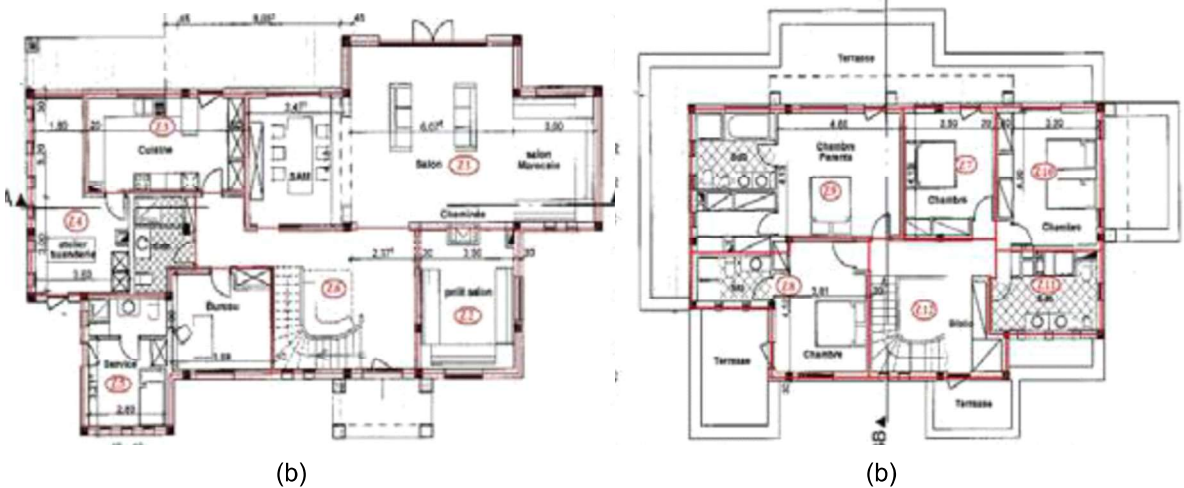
Dar Amys plan view: (a) 1st floor level and (b) second floor level [2]
